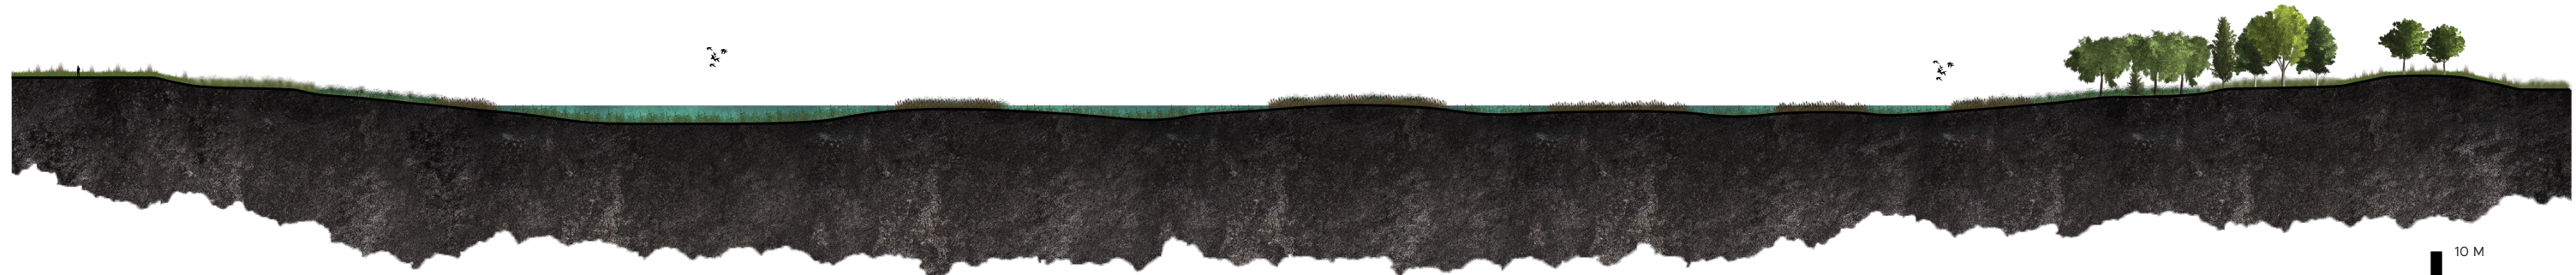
Section AA - East to west section cut facing north on the south side of the channel wetland
